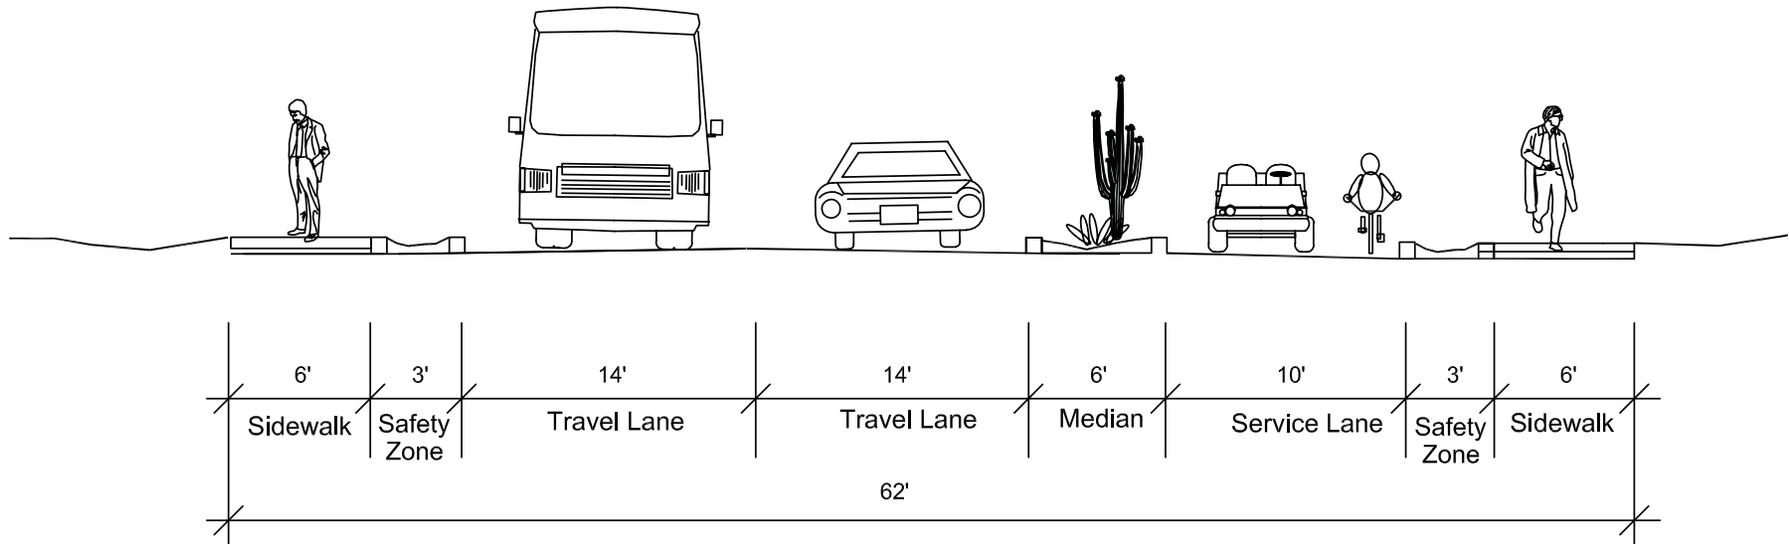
D-2 - Street Section: Wyatt Drive (within PAD District)
